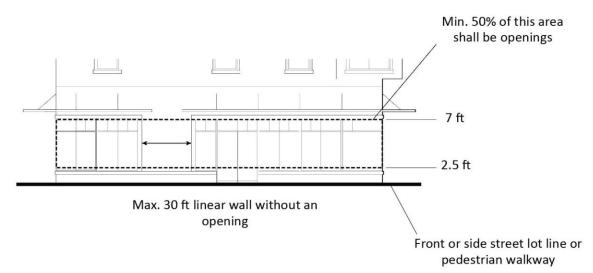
Building Transparency/Required Openings Exhibit
